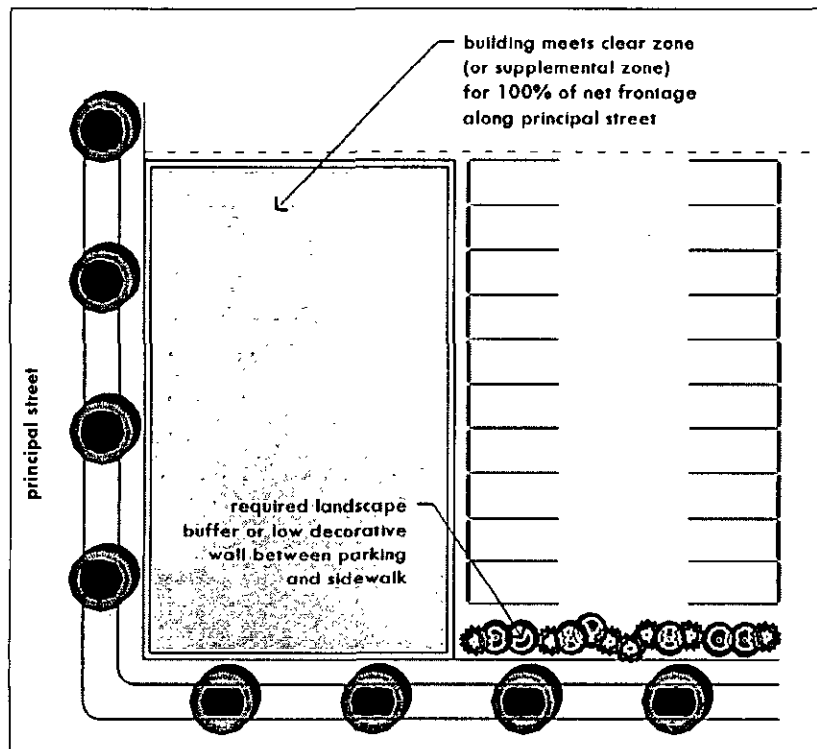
Corner Site on a Suburban Roadway (shown as "principal street")
